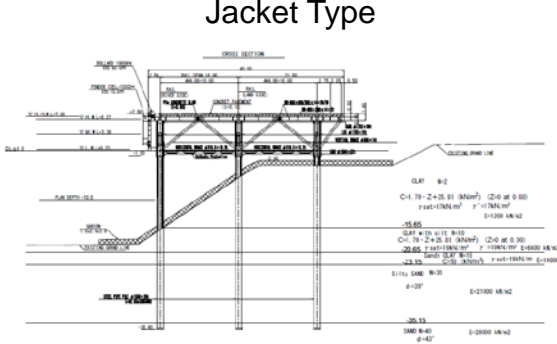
Typical Cross Section and Pile Arrangement of Jacket Type Jetty
